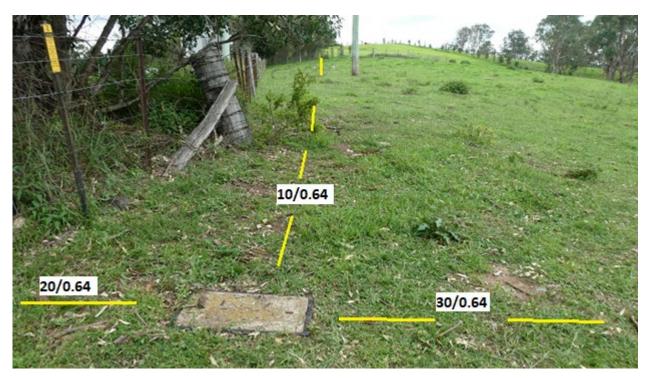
View of Telstra No5 Pit in private property on north side of Thirlmere Way outside the Study Area. Photo shows line of NBNCo cable 30/0.64 from across LW W3 W4 inside Study Area, north-west 10/0.64 to two properties outside the Sudy Area and 20/0.64 crossing Thirlmere Wayto the south outside the Study Area. See Plate 1 showing crossing Thirlmere Way outside the Study Area. Cables are grease filled hard jacket resilient cables.
